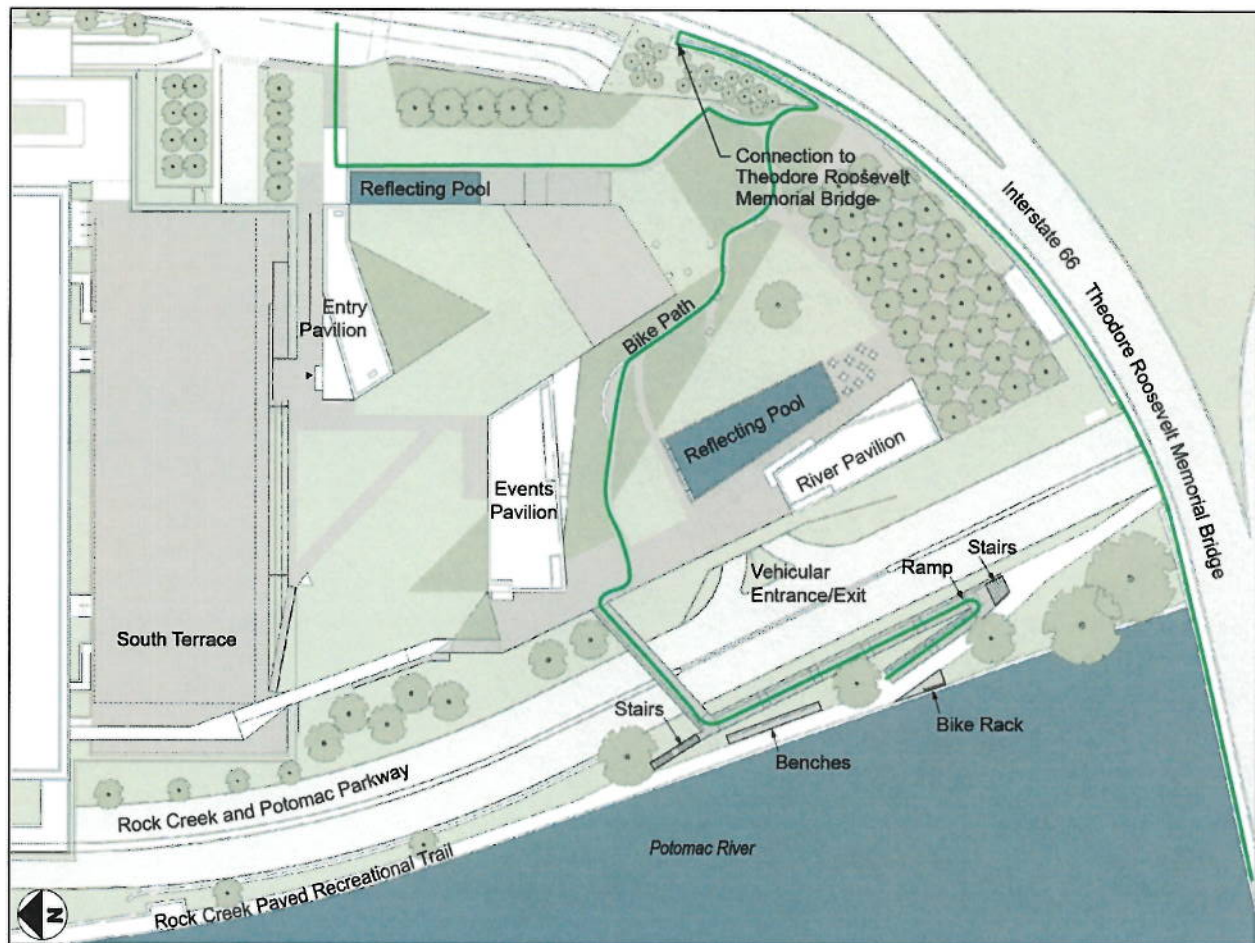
Alternative C - Bridge Access with Ramp and Stairs
